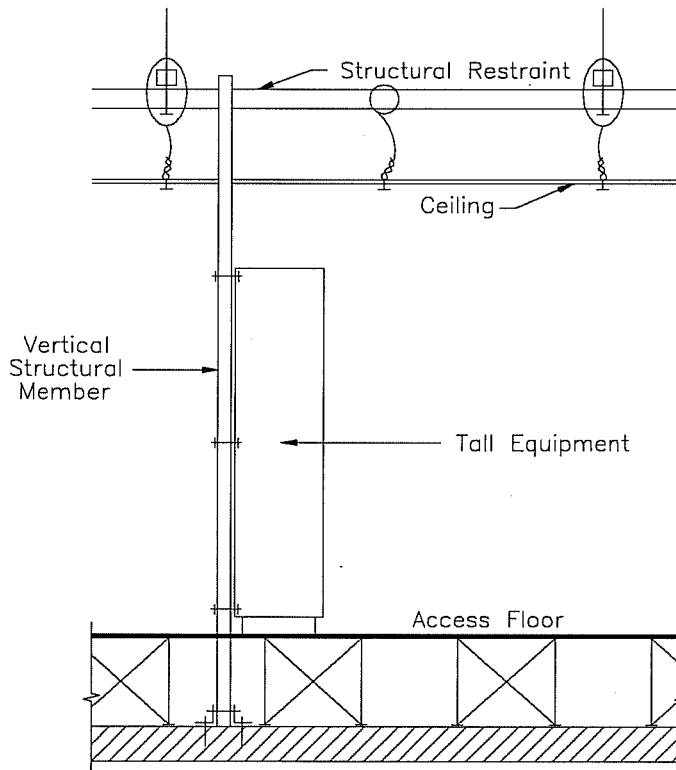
Computer Equipment Vertical Seismic Bracing (Ref. 11)
